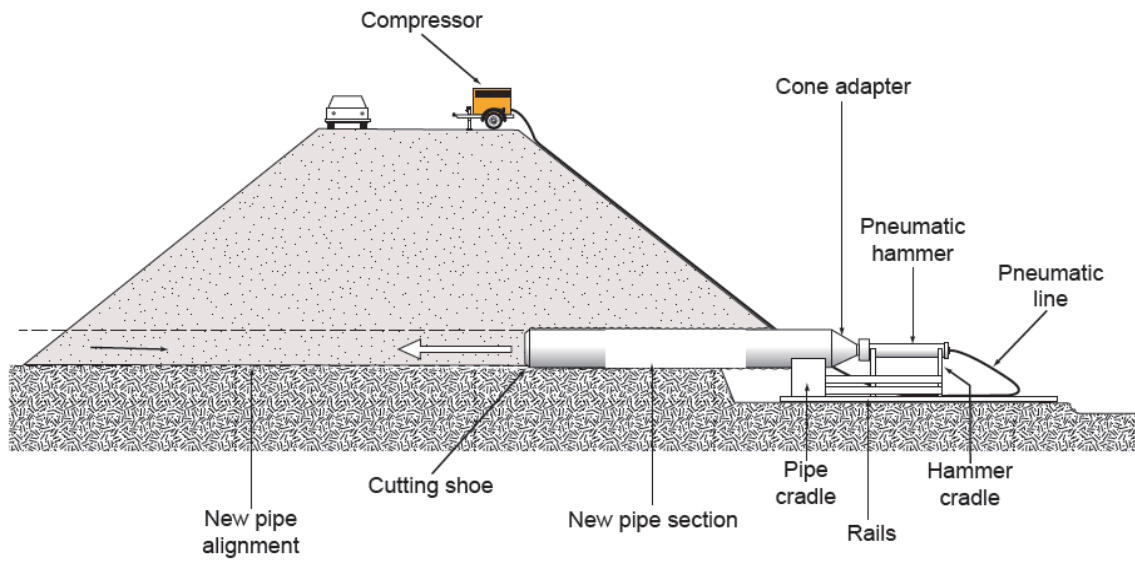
Typical pipe ramming setup for embankment (after Piehl 2005).
